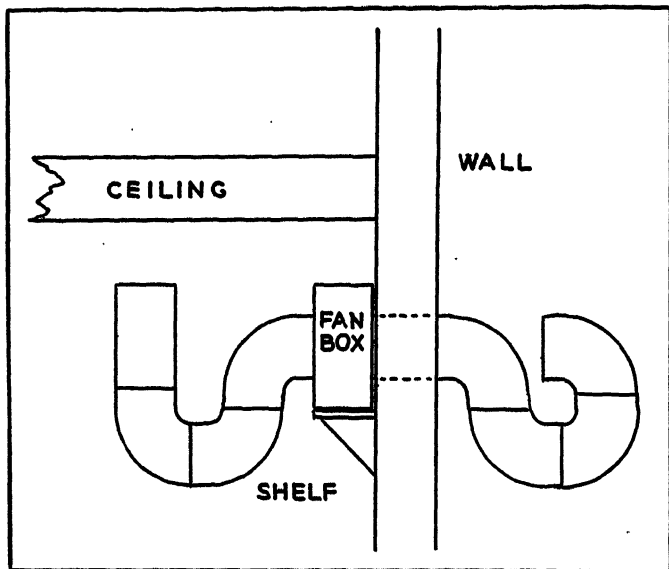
Darkroom ventilator made of stovepipe elbows and fan.
